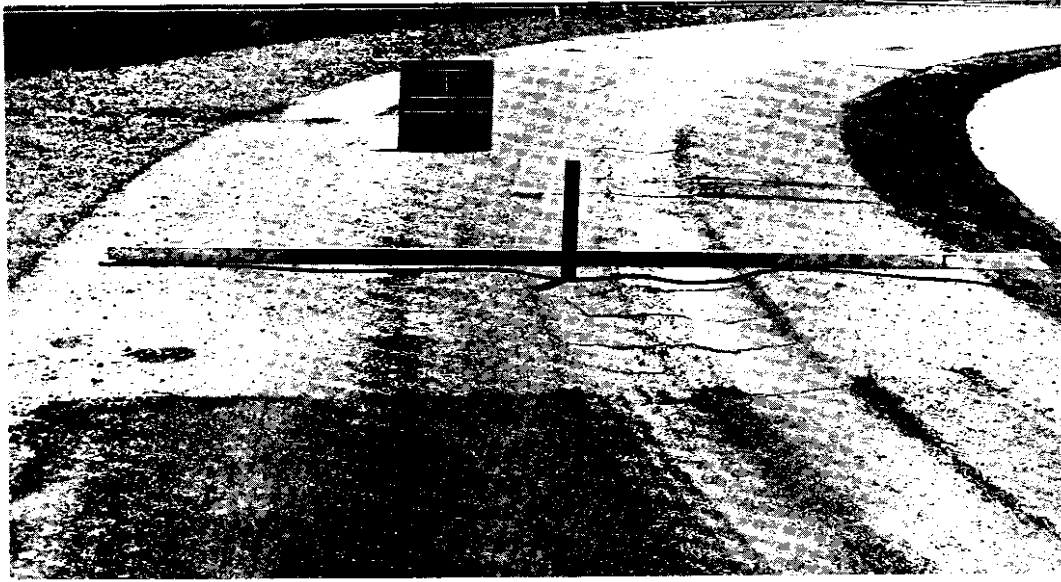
CONTINUED DETERIORATION OF SECTION 6 AFTER 158,031 WHEEL LOADS ON MAY 22, 1969. NOTE THE DEPTH OF THE RUTTING AND THE TRANSVERSE CRACKS.
